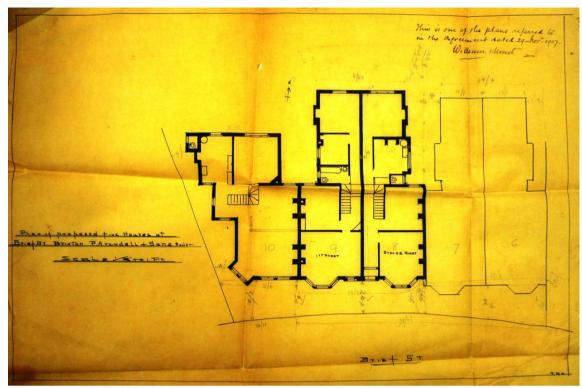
Floor plans for the same buildings. The site was previously used as builder's yard of the Cooperative Builders during construction of the flats in Cormont Road and Hayes Court (Ibid.).
